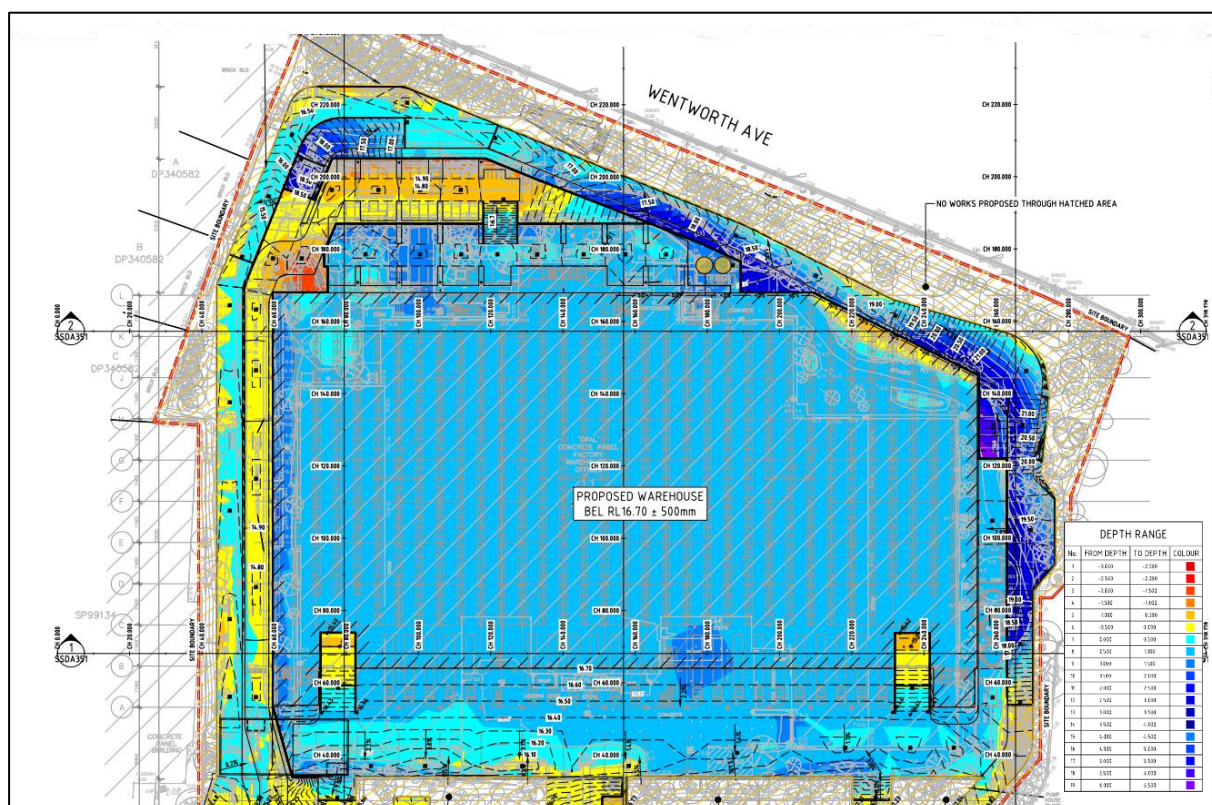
Proposed Excavation (Source: Costin Roe Consulting, 2024)
